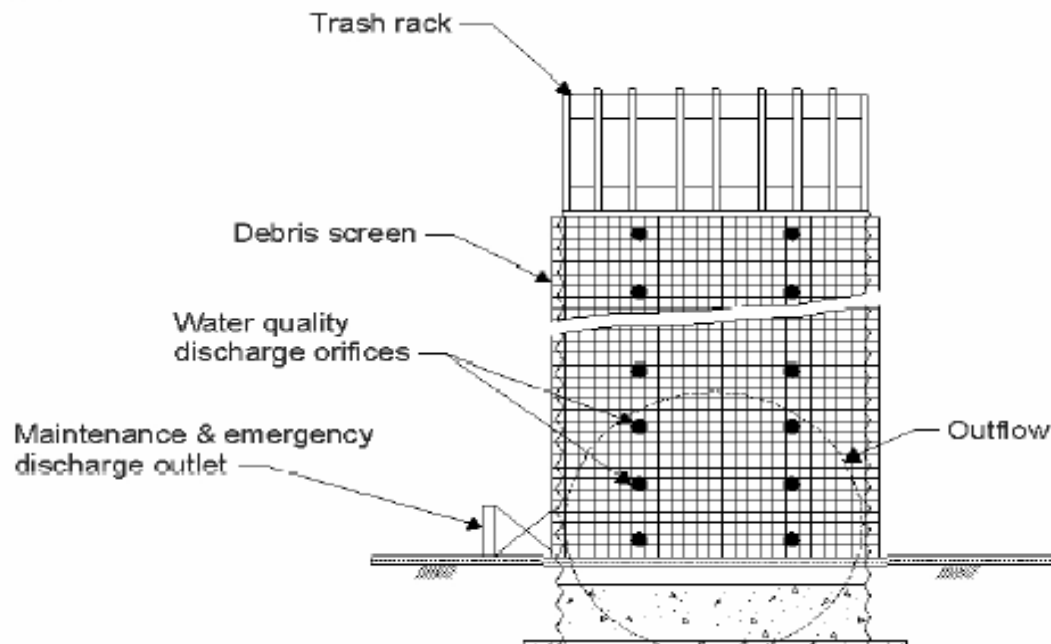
Multiple orifice outlet riser (CA Stormwater BMP Handbook, 2003)
